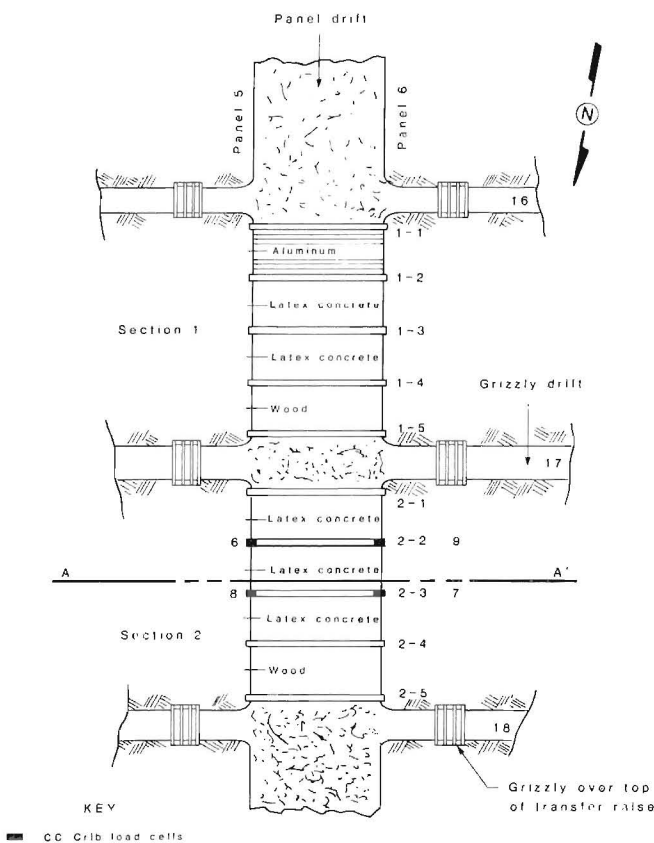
Instrumentation plan for test drift, 2615 grizzly level.
